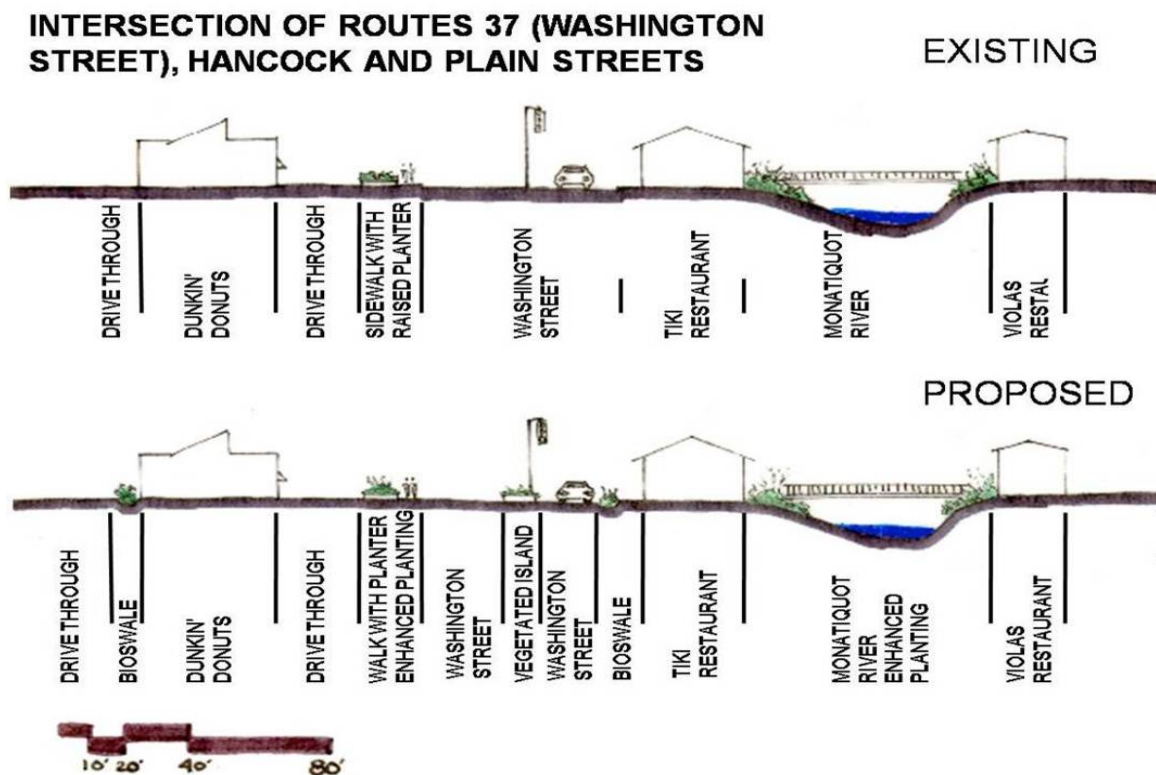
Existing and proposed cross-section renderings of the intersection of Routes 37 (Washington Street), Hancock and Plain Streets.
